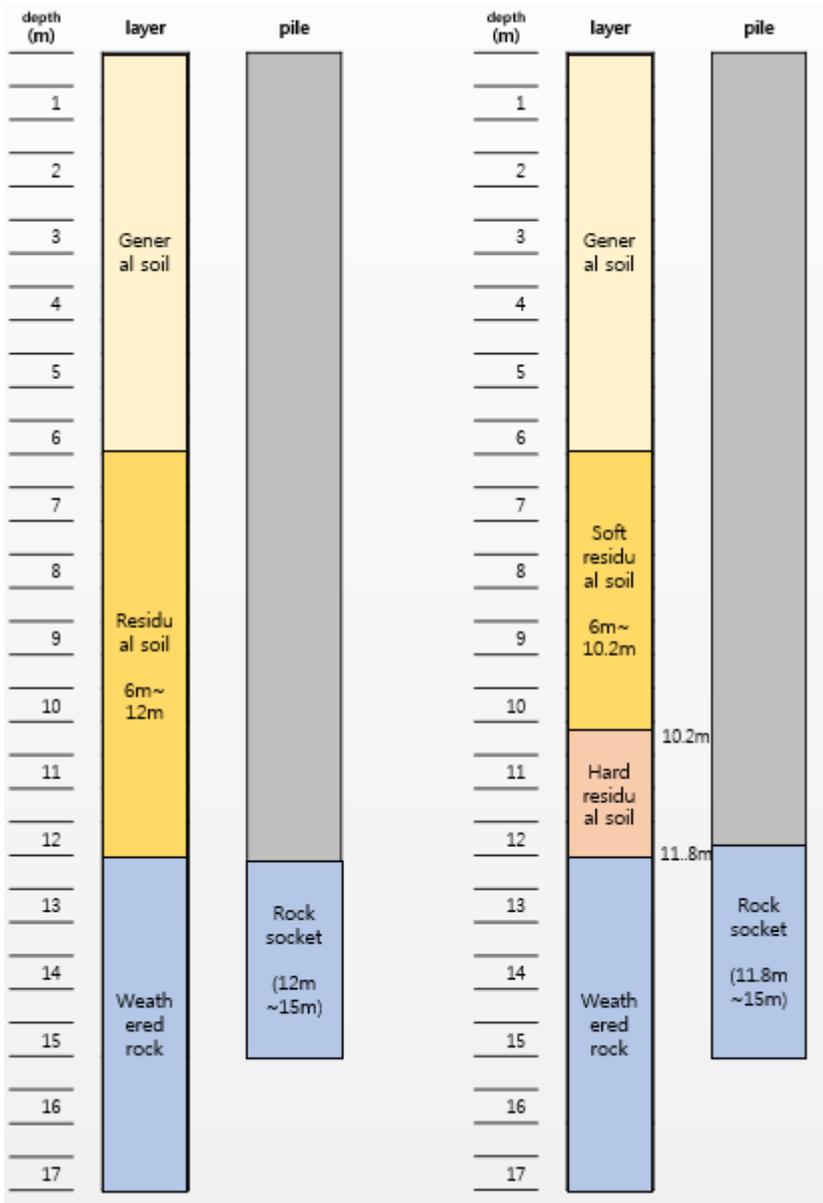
Section view of the subsurface layer for pile No. 7 before and after Modification
